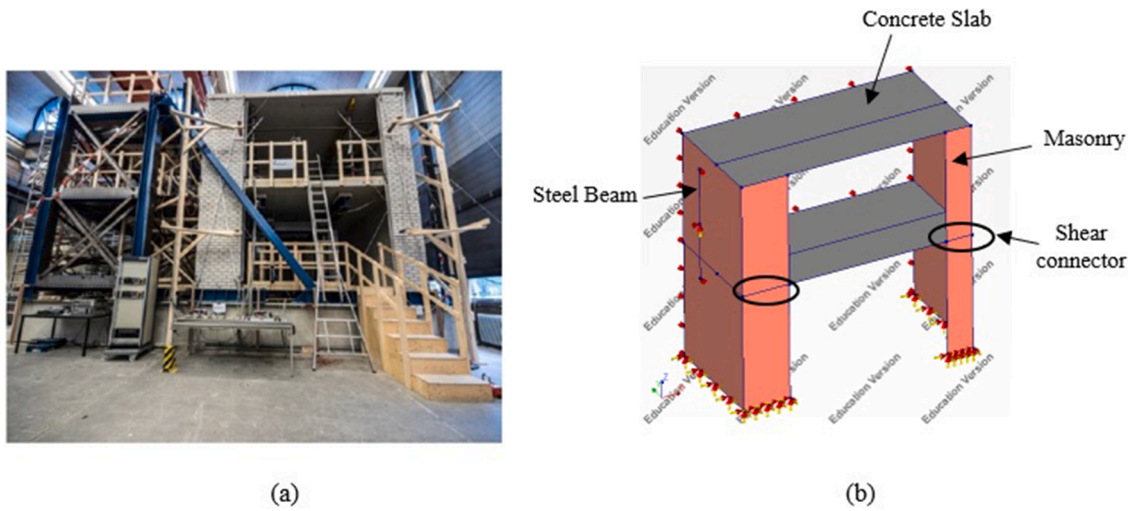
(a) Specimen and construction detail of a typical two-storey terraced house [3] and (b) simplified modelling schematic.
